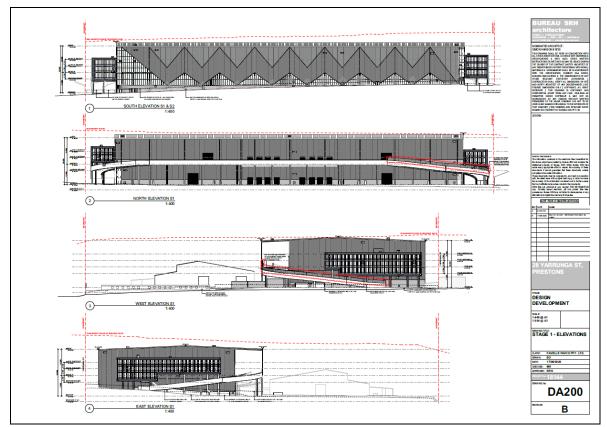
Elevations (Stage 1). Source: Plan DA200 Rev B prepared by Bureau SRH Architecture.
